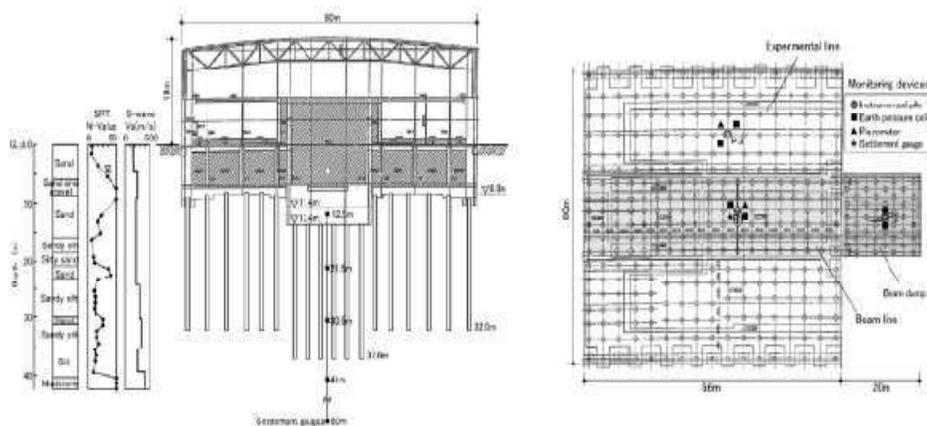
Soil profile, foundation plan and elevation of Hardon experimental hall (after Yamashita et al., 2011)
